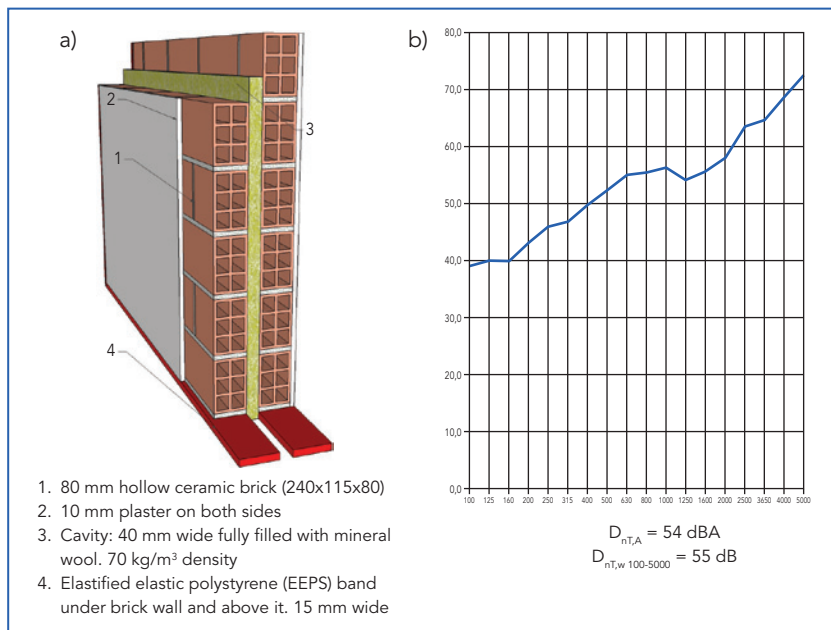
a) Example of Type 2 separating wall. Cavity wall.
